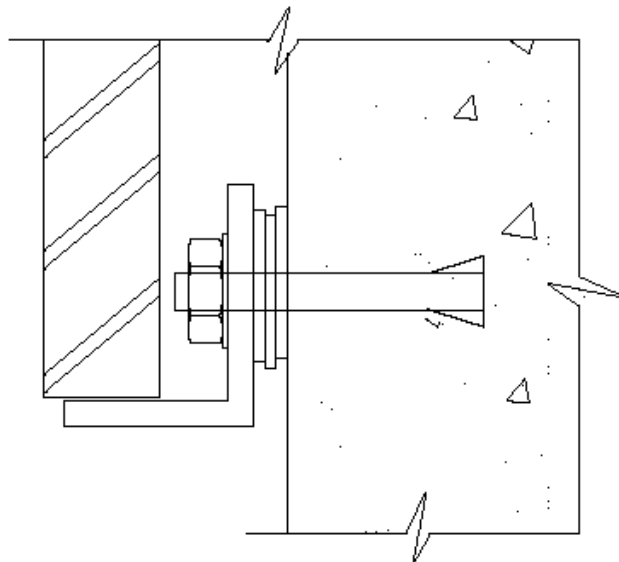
b. Shelf angle with washers inserted to correct for construction tolerances.
